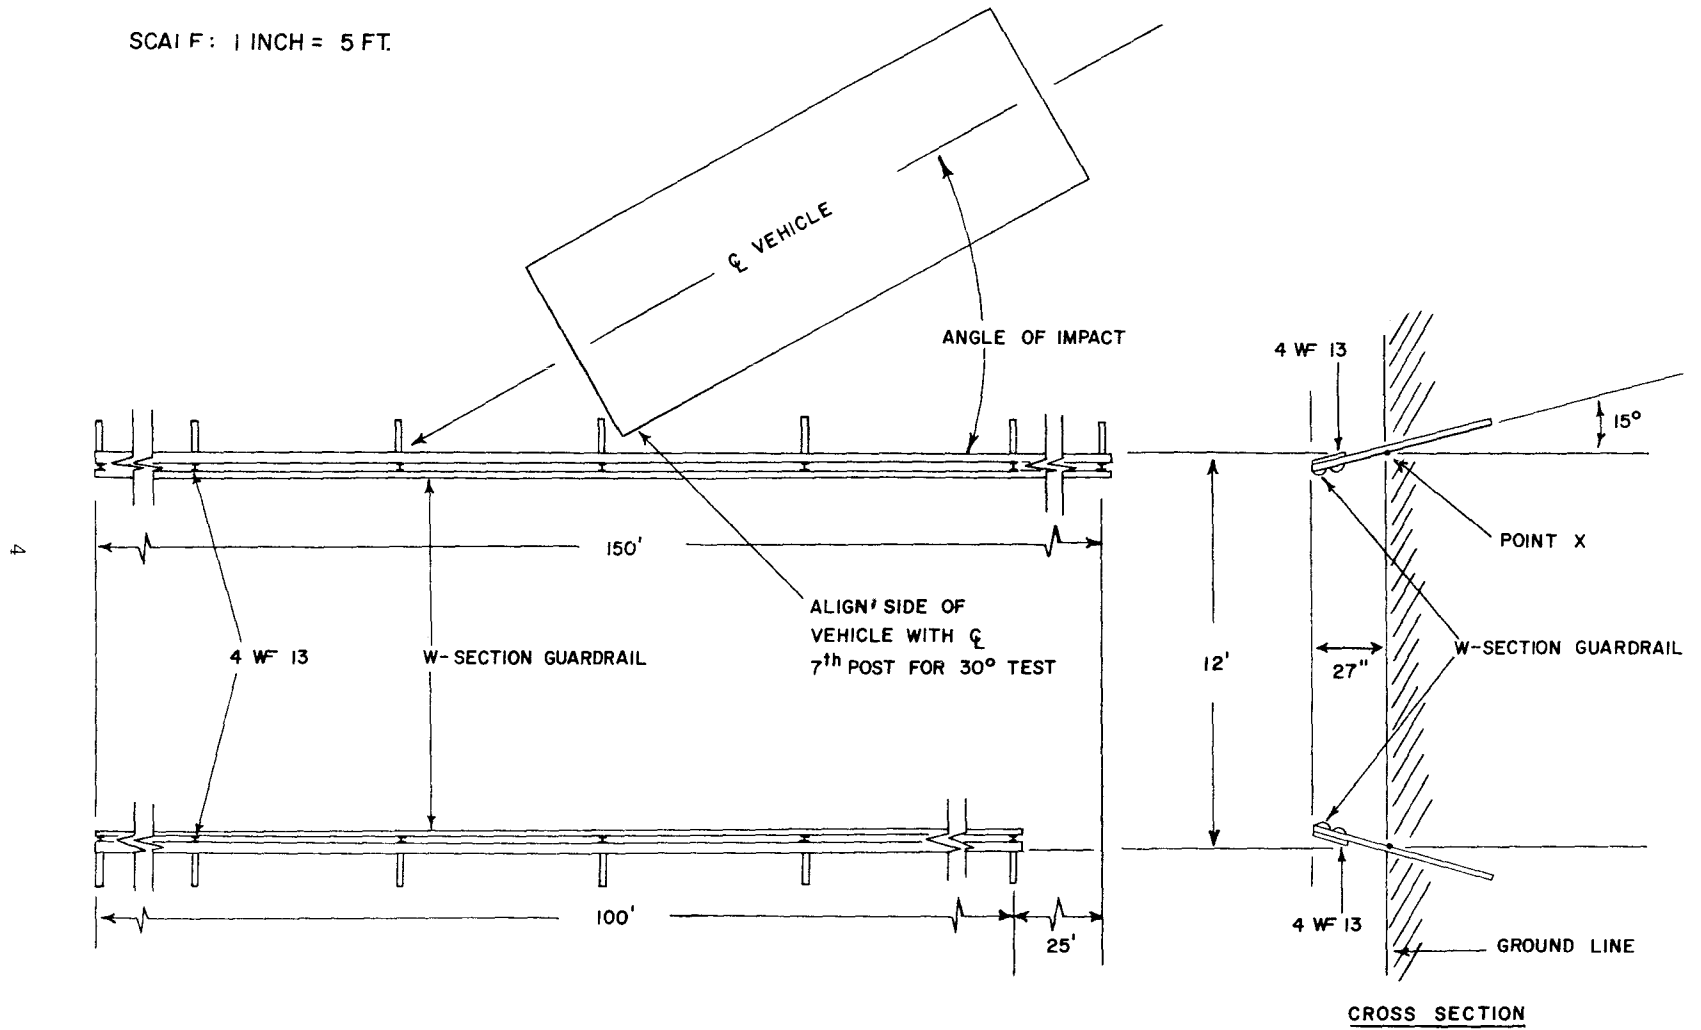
, PLAN VIEW OF ONE-WAY GUARDRAIL ARRESTING SYSTEM
